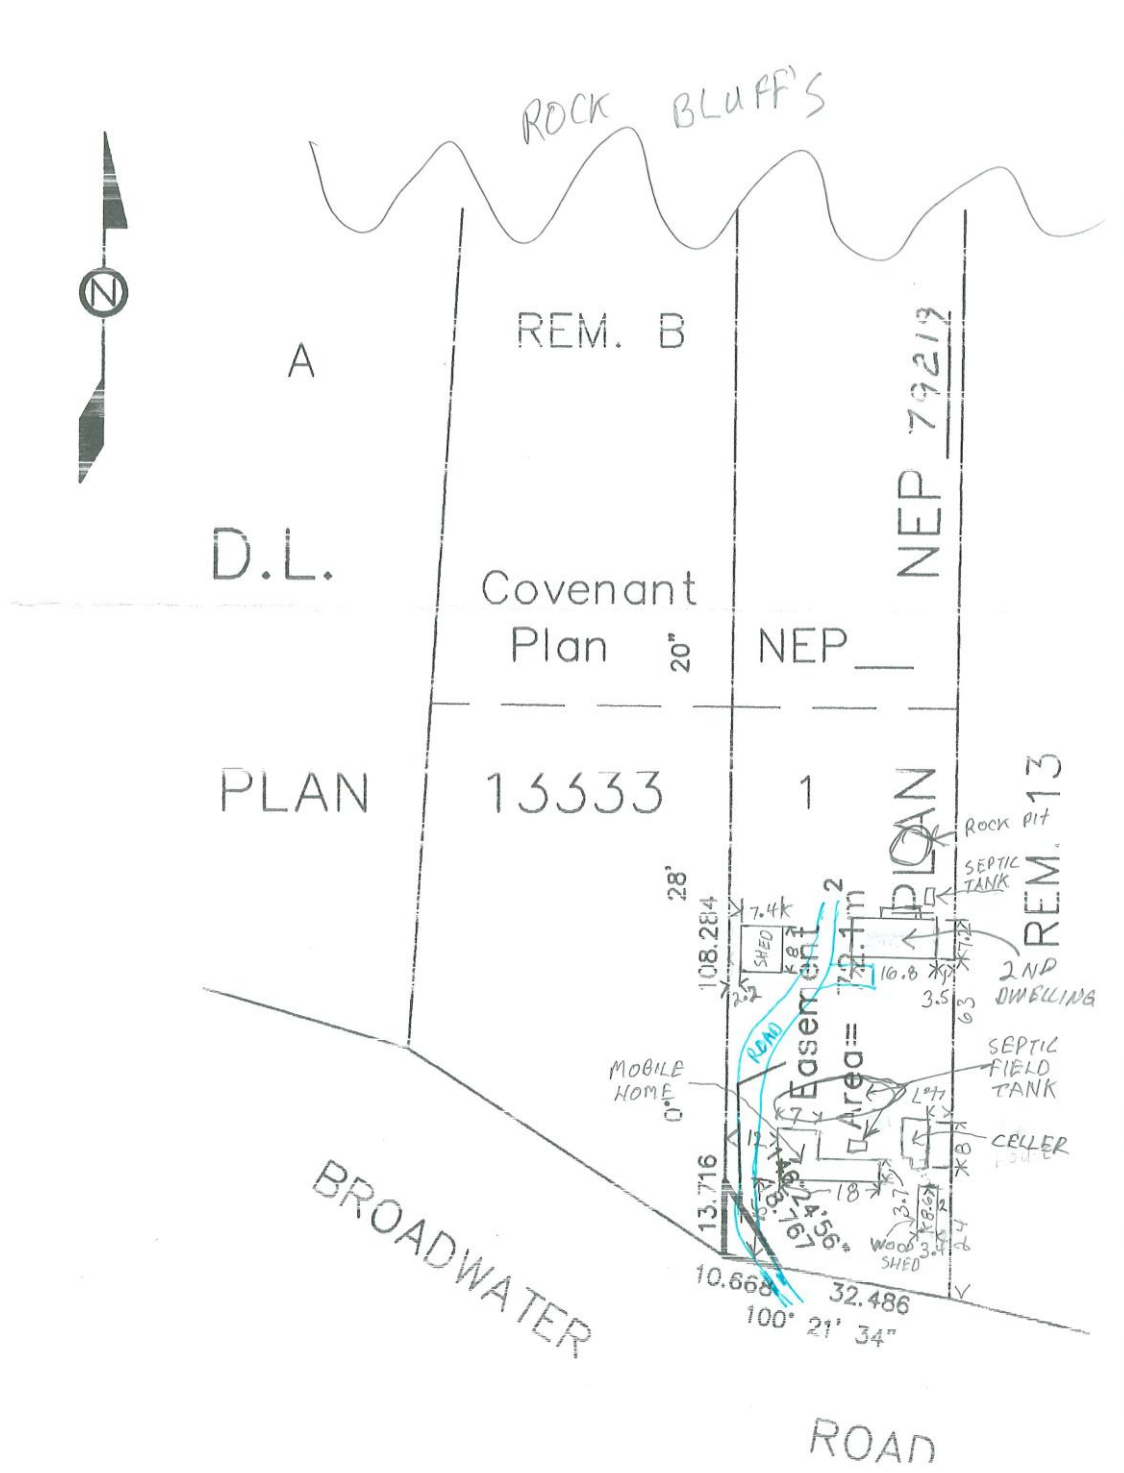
Site Plan showing original dwelling (manufactured home) and the non-conforming second dwelling.
